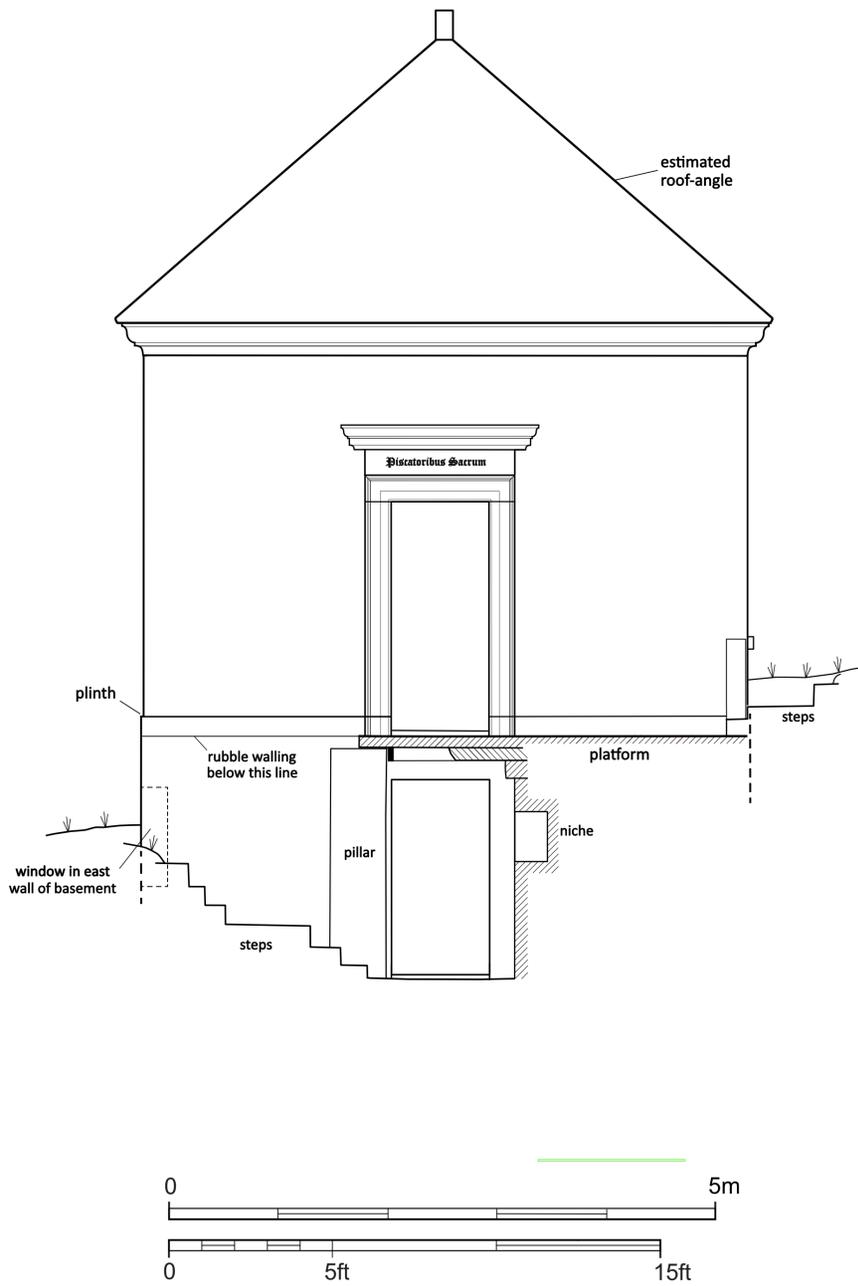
Bridge Cottage, Cromford: North face of the building and section through the external platform. Scale 1:50.
